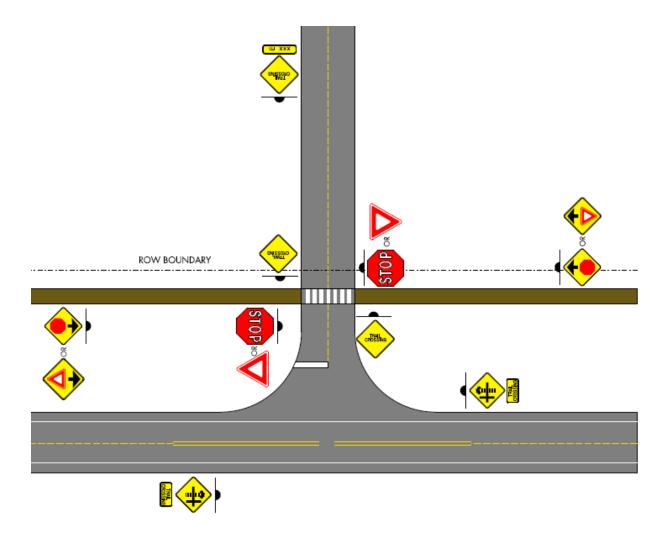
Typical arrangement for trail crossing of minor local road outside of the Clear Zone (Alberta Transportation, 2015)
